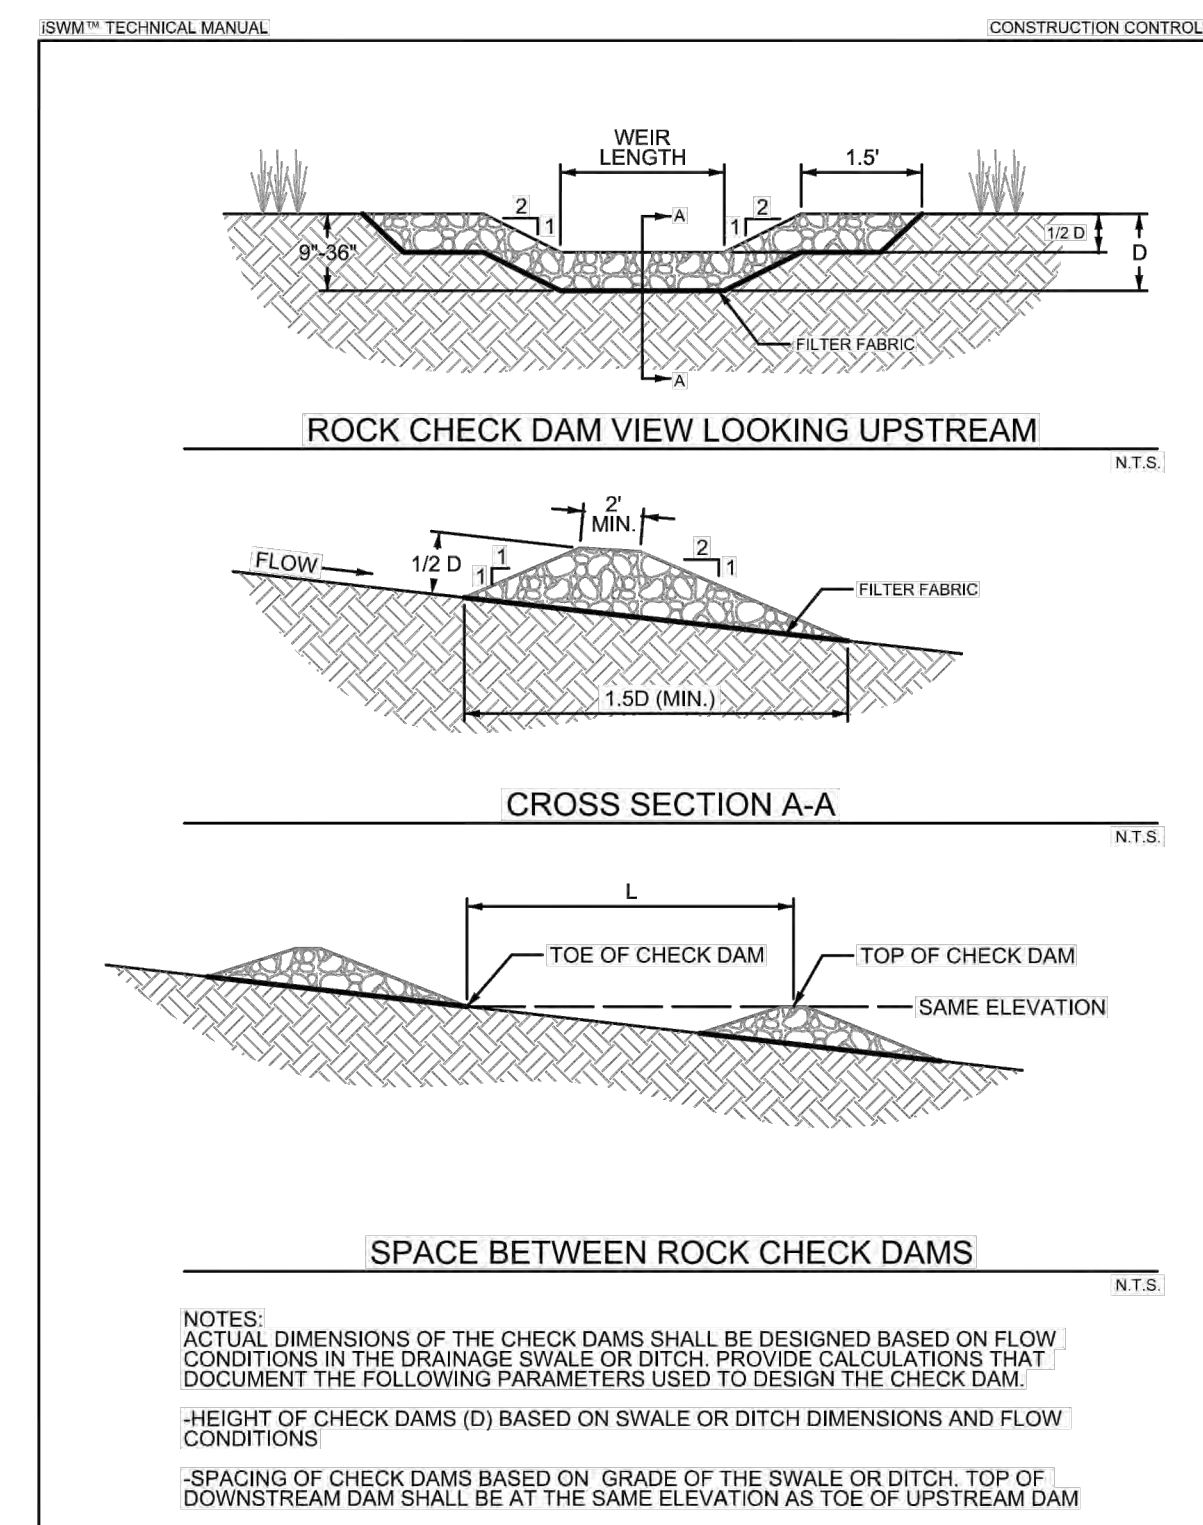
STANDARD CONSTRUCTION DETAIL - ROCK CHECK DAMS (1 OF 2)
